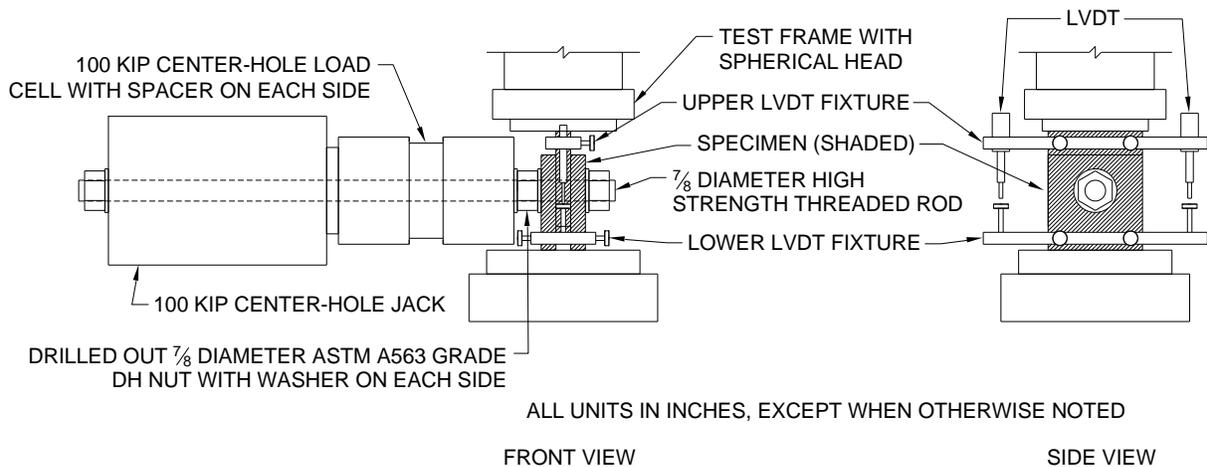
Drawing of Standard Compression Slip Test Specimens
